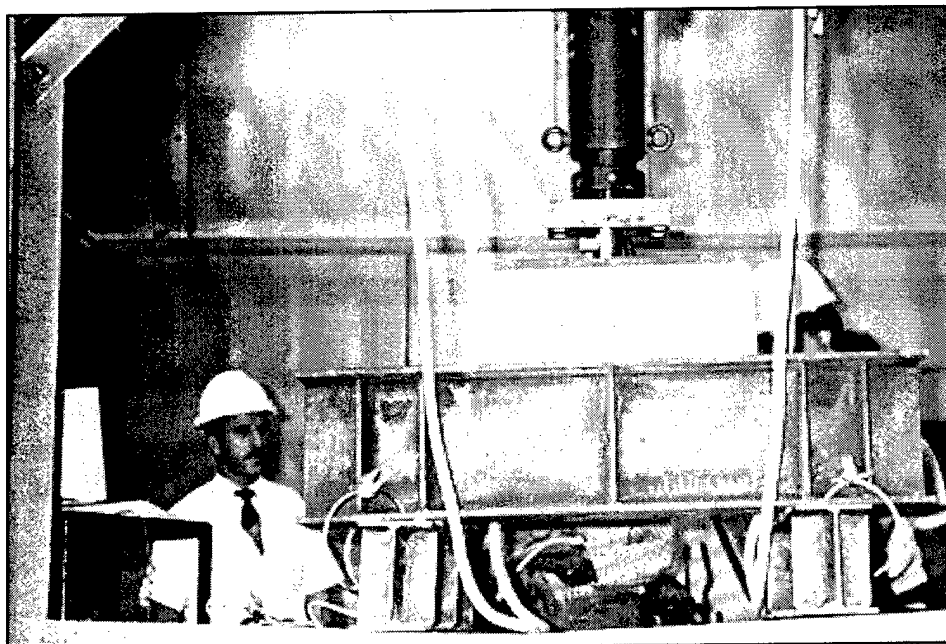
Failed ungrouted test specimen (TPIUG3).
